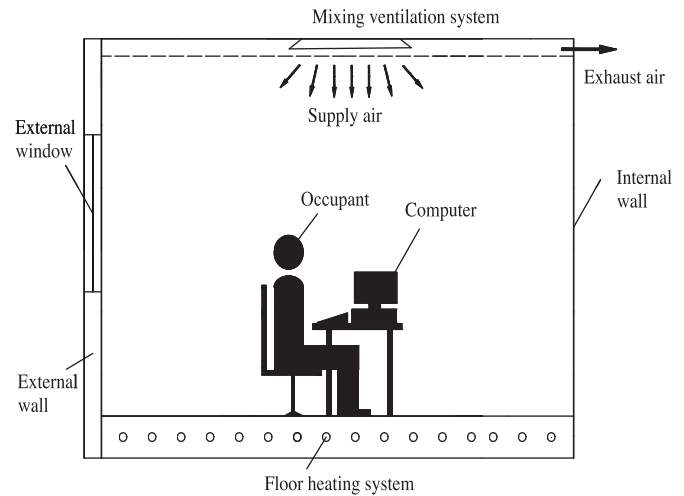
A typical office room with floor heating system and mixing ventilation system.
